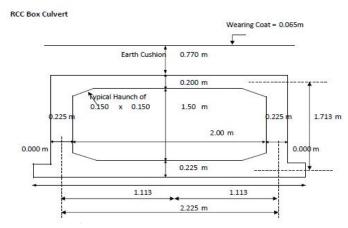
Box Culvert with Cushion thickness 0.777m
